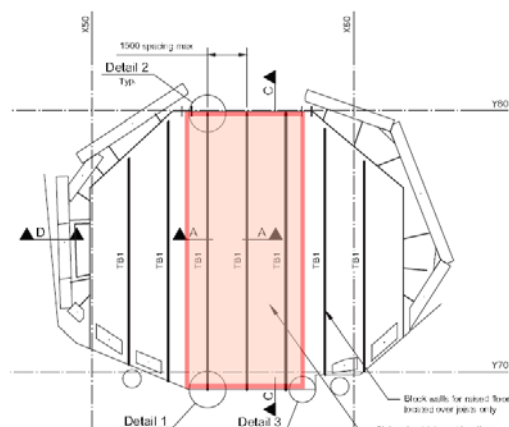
Plan of floor area to be assessed in this study (ARUP 2014)
